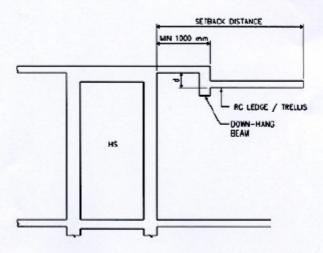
(c) - DOWN-HANG BEAM NOT LOCATED ALONG EXTERNAL BUILDING LINE
